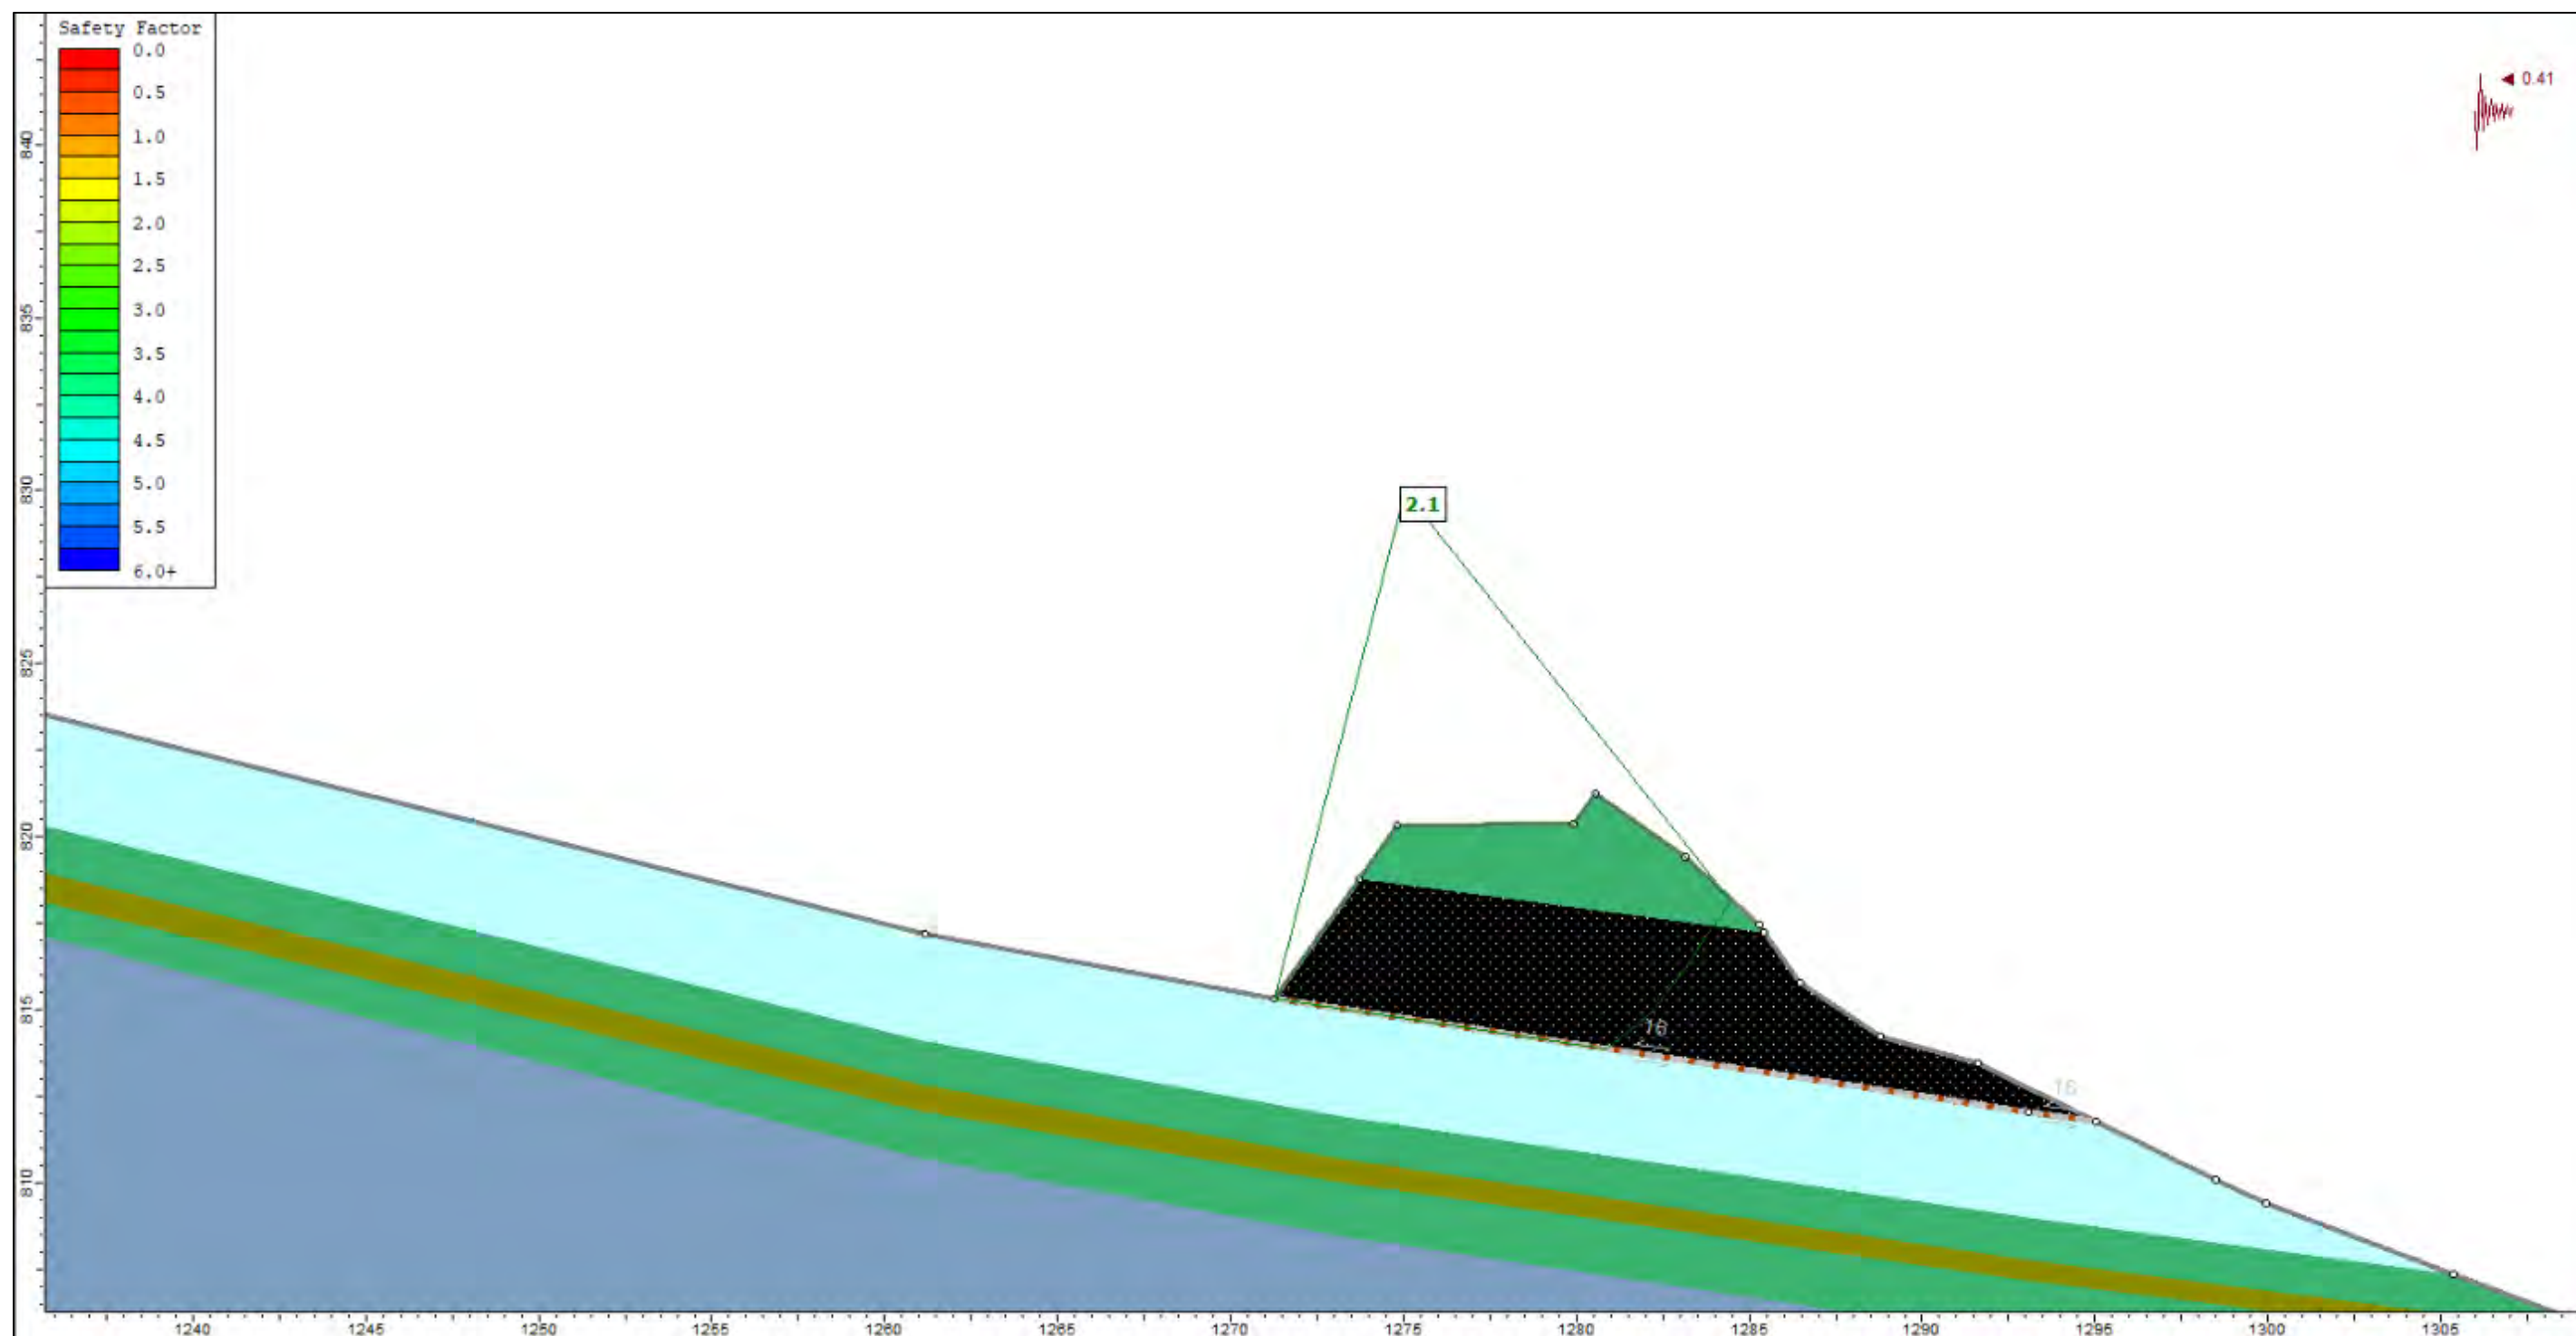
Slope Stability Analysis of West Pit – Southern Highwall – Failure into Pit– Section 102 – ULS Conditions.
